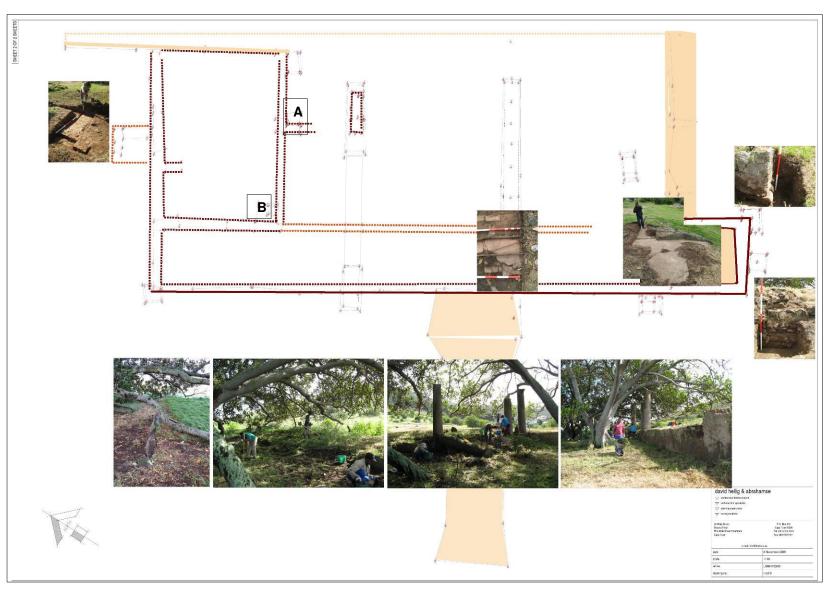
Site plan of the main house with stone foundations/walls indicated by brown lines and brick walling by orange lines. The tan areas represent cemented surfaces.
